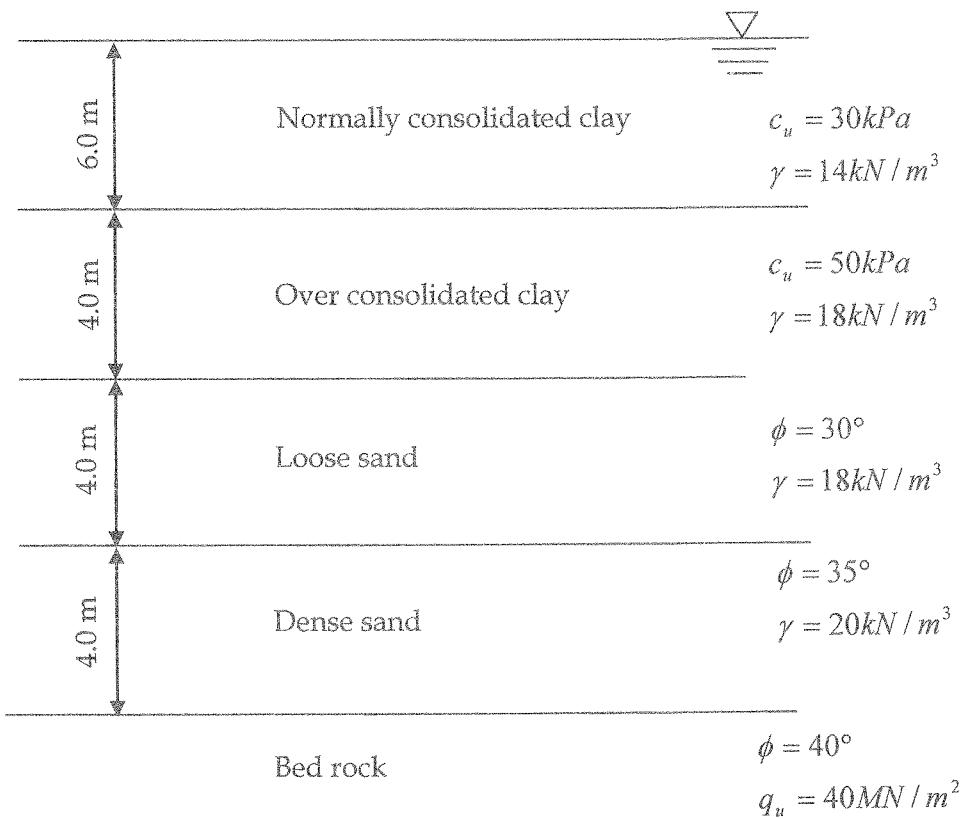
Sub-surface soil profile at the proposed bridge abutment
